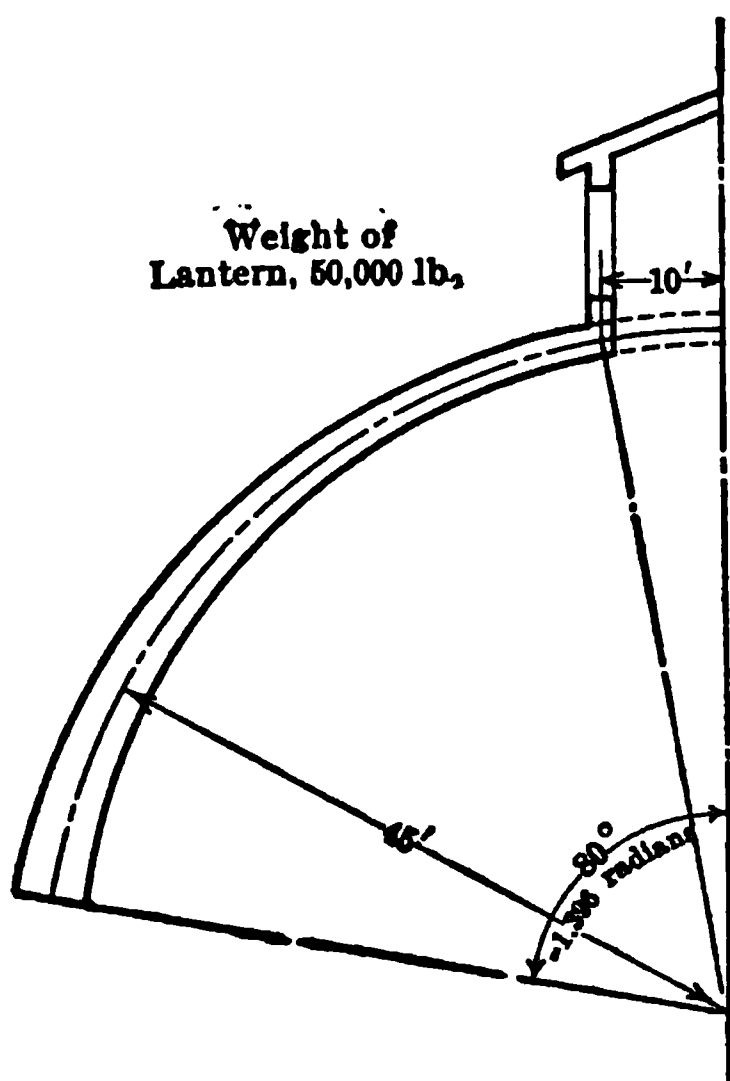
Smooth-shell Concrete Dome with Lantern and Eye. See Example
